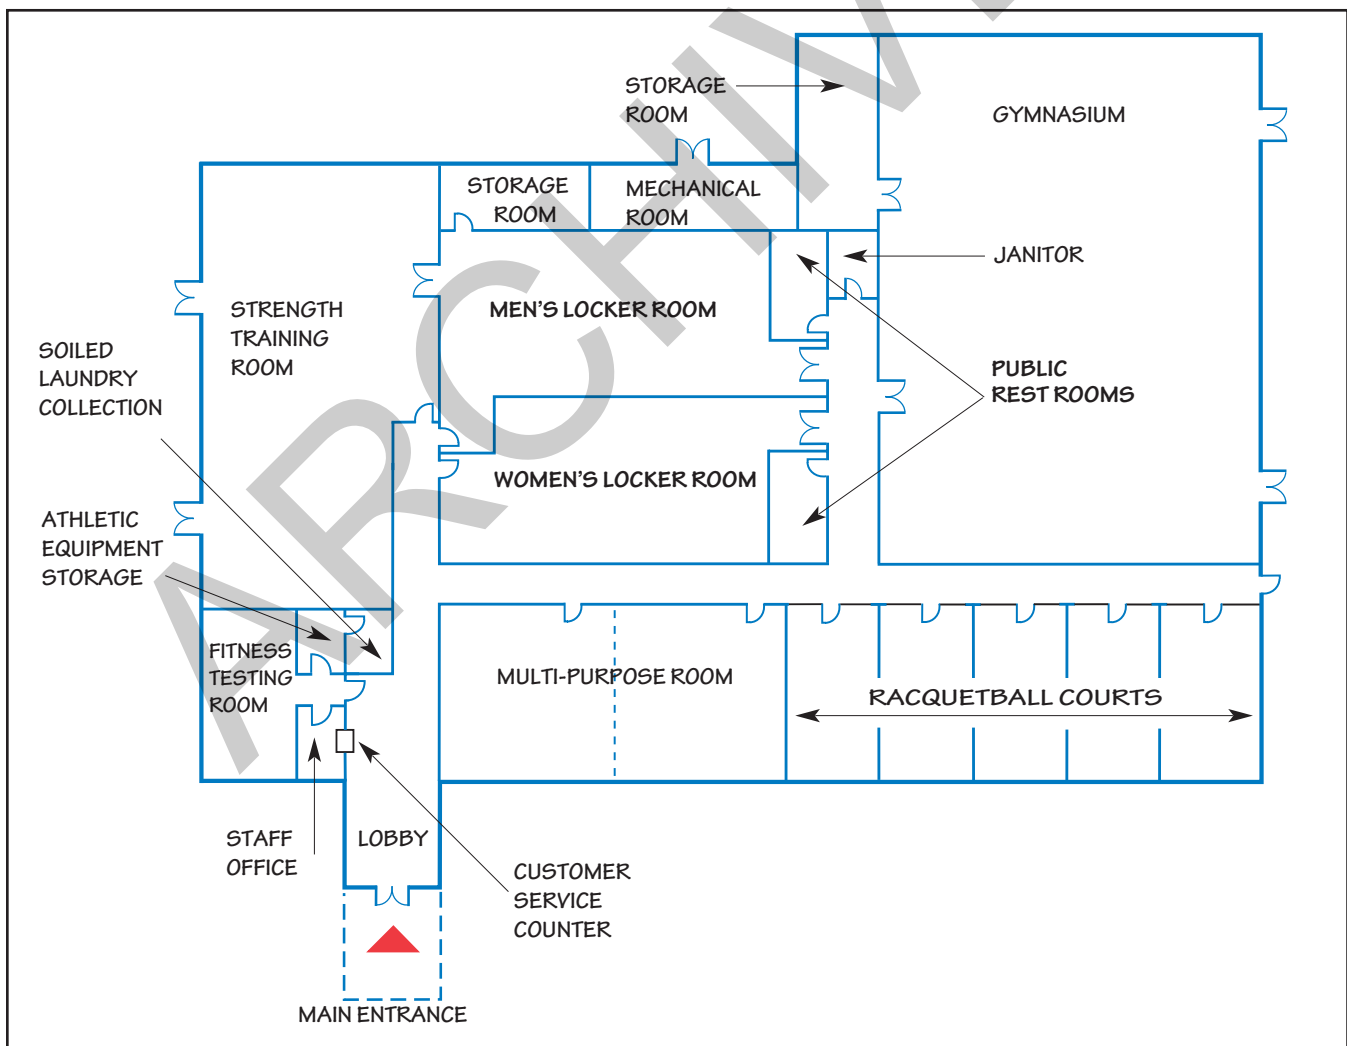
B: Concept Floor Plan for the Sports and Fitness Center.
